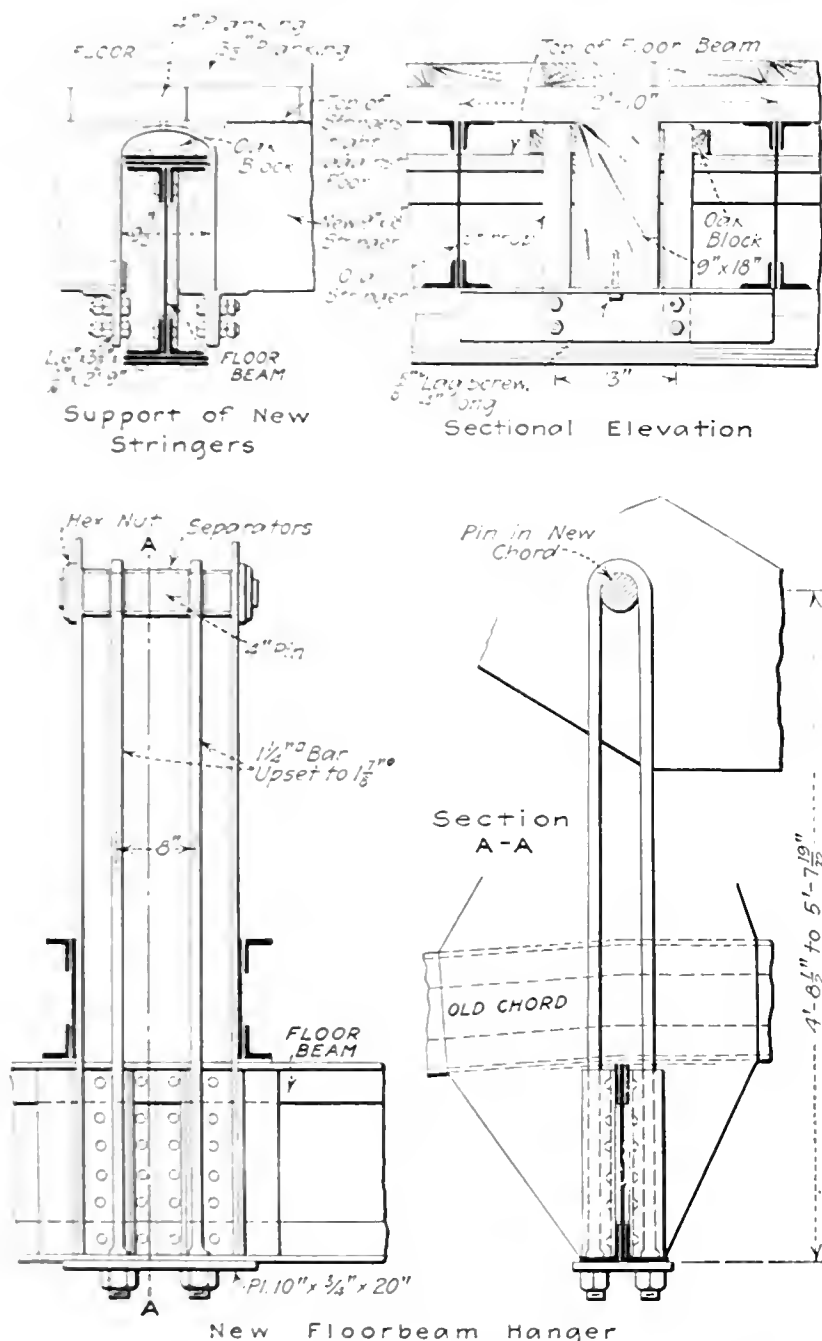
FLOOR-BEAM HANGER AND STRINGER STIRRUP
